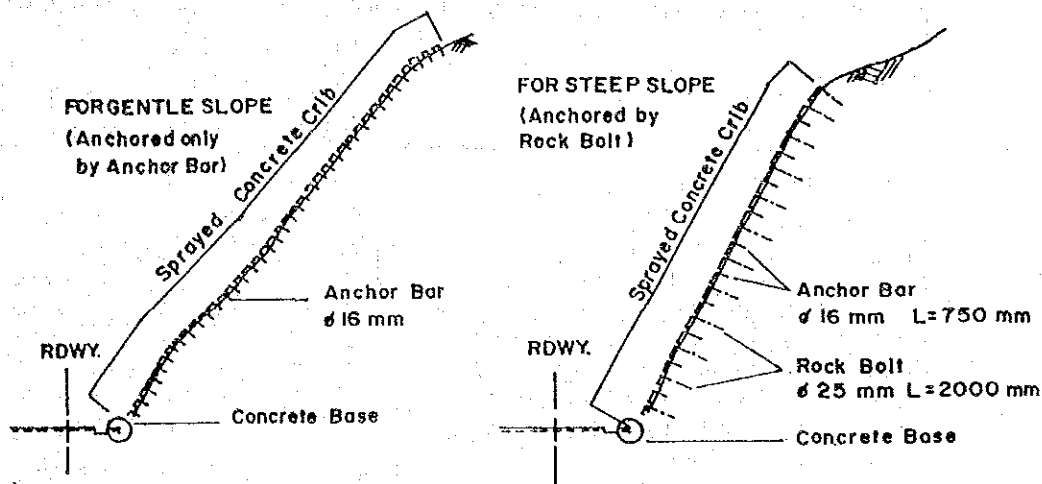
SPRAYED CONCRETE CRIB
